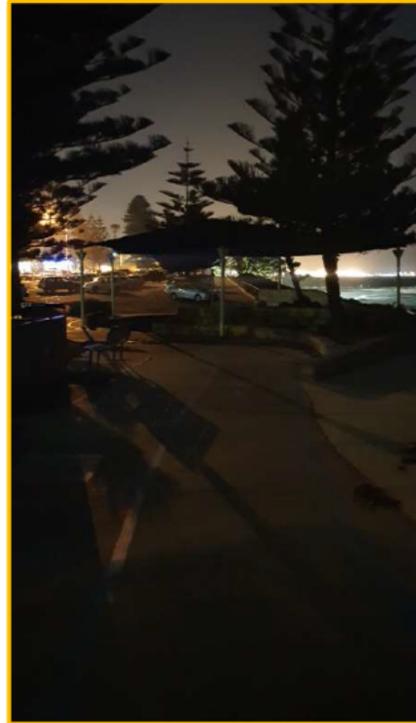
Looking north on Marine Parade from the Pearse Street intersection – Dark patches on road and adjacent paths.
